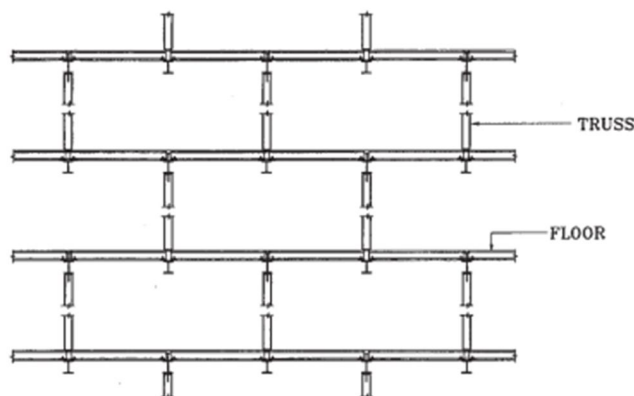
Staggered-truss system-vertical stacking arrangement.
